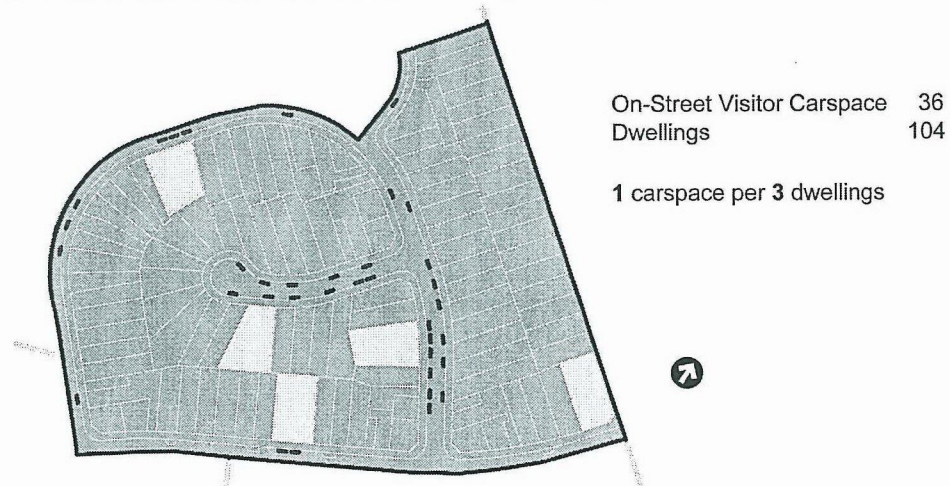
ON-STREET CAR PARKING SPACES (STAGE 3)
